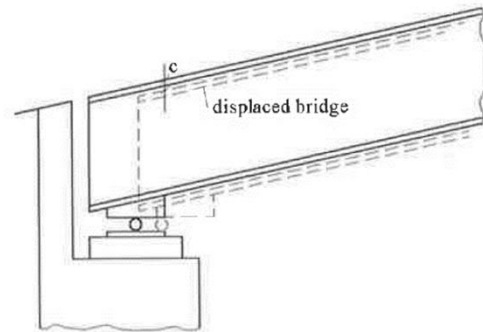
Horizontal arrangement of the bearings (case a)
